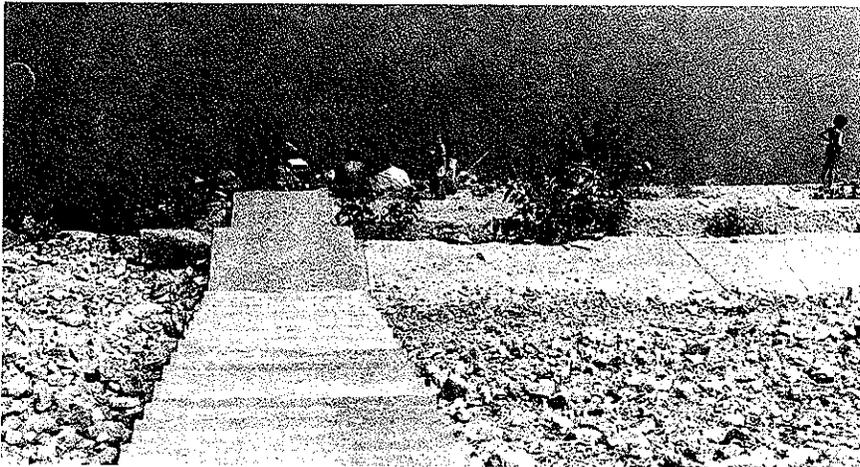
Steps and platforms provide fishing access on a riprapped levee
